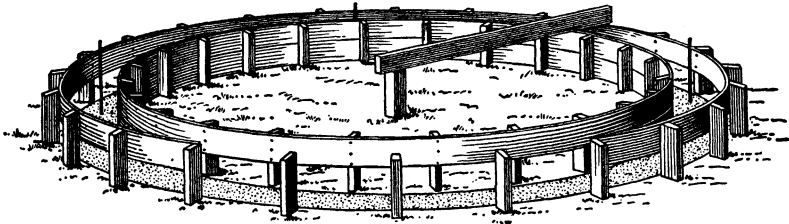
Form for foundation extending above ground, partly boarded up.
